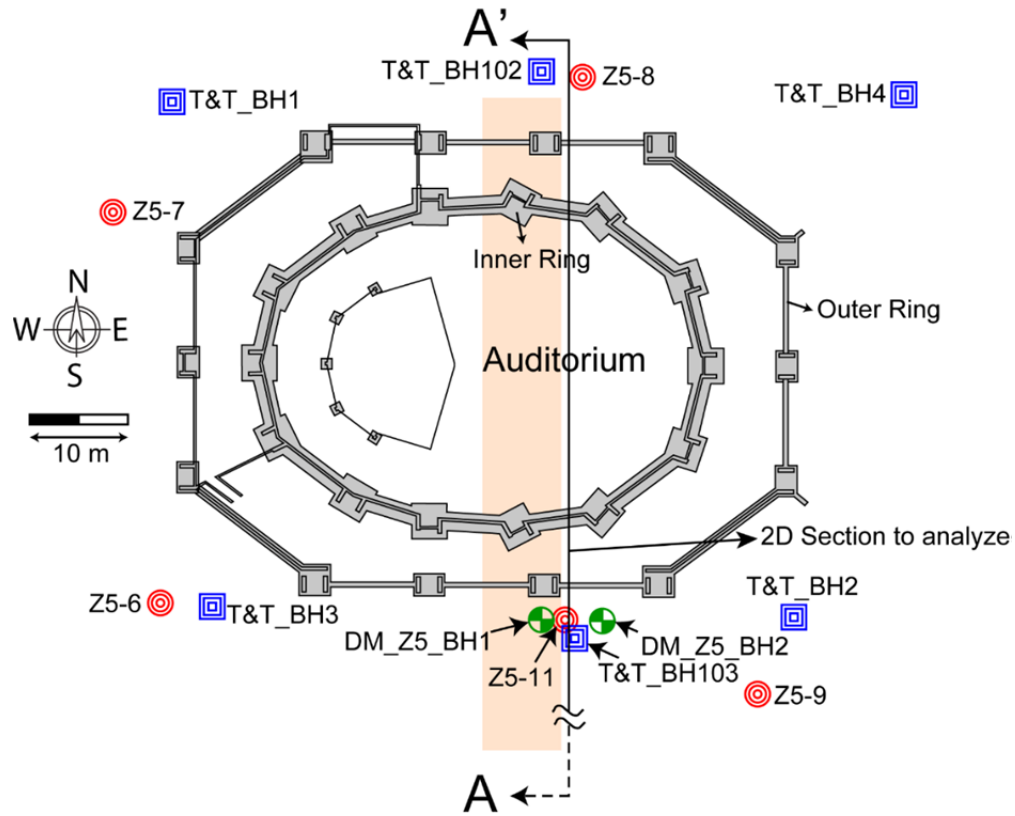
Plan view of the CTH Auditorium structure showing also the site investigation performed in the site.
